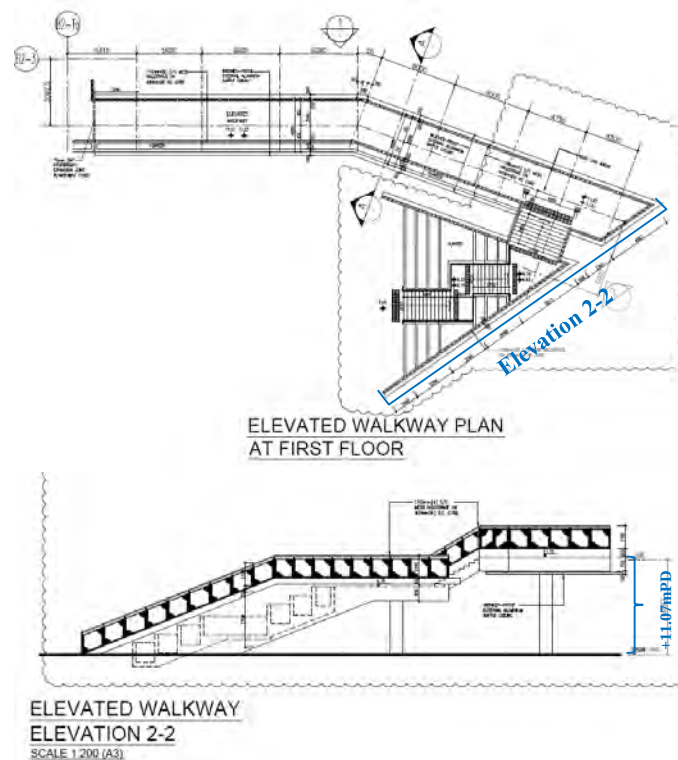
Layout Plan and Elevation of Elevated Walkway and Staircase within the Open Space for the Proposed Scheme
